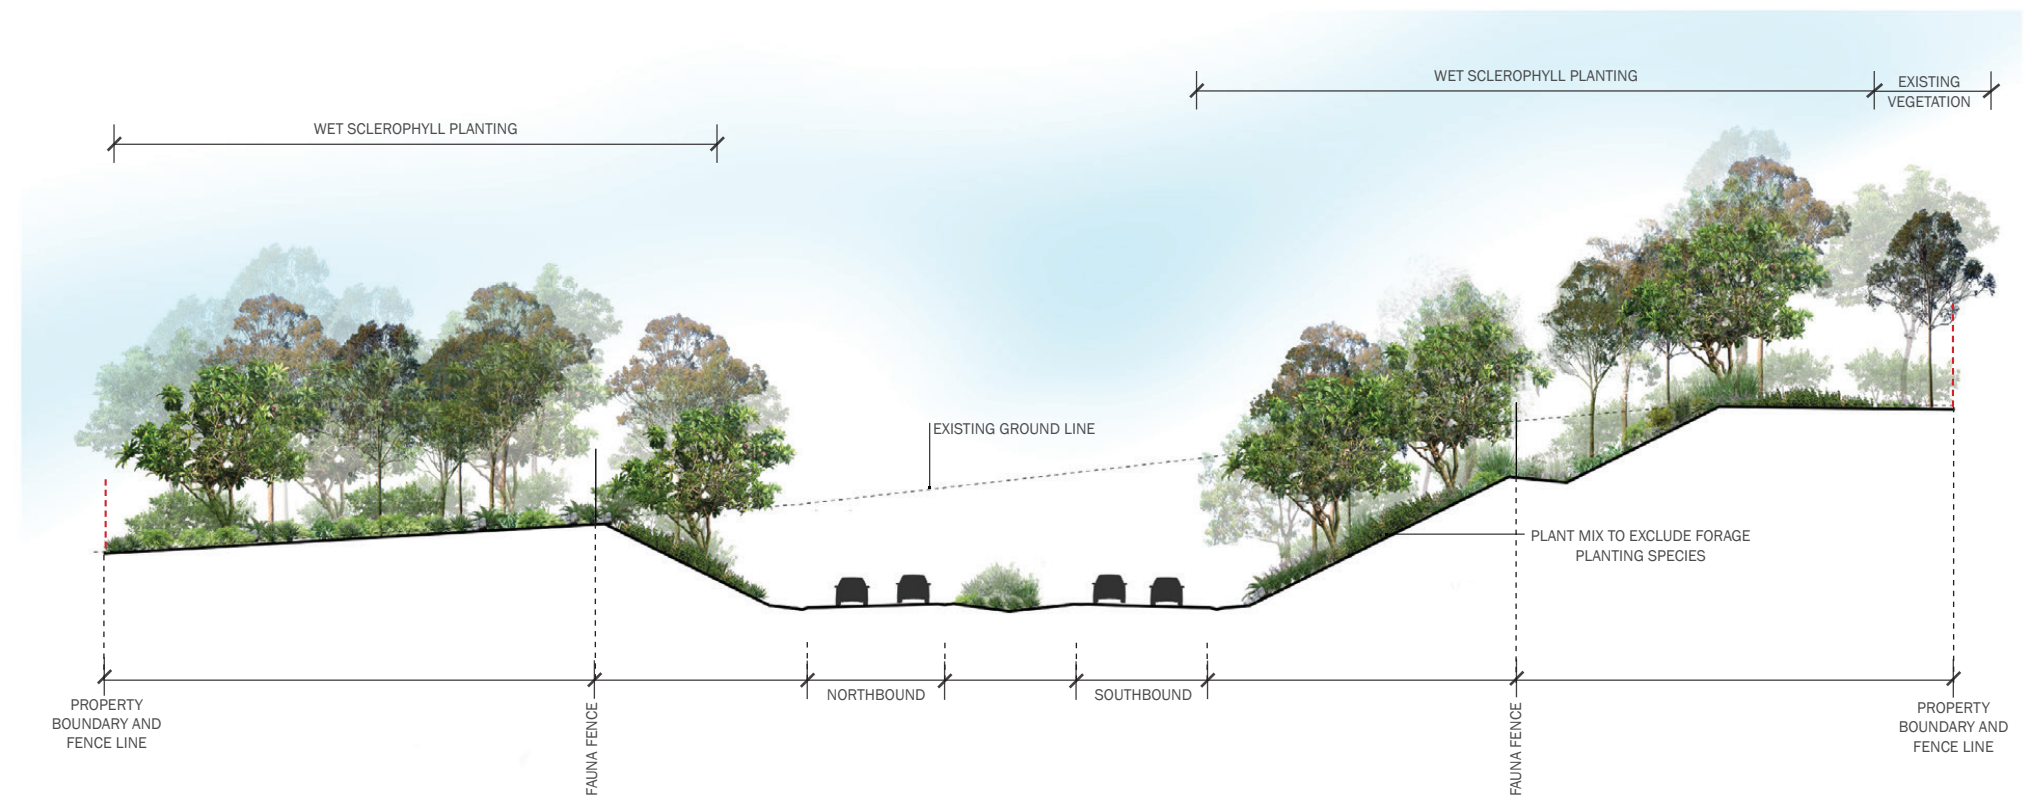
Cross section B-B in Bagotville (Scale 1:400)
